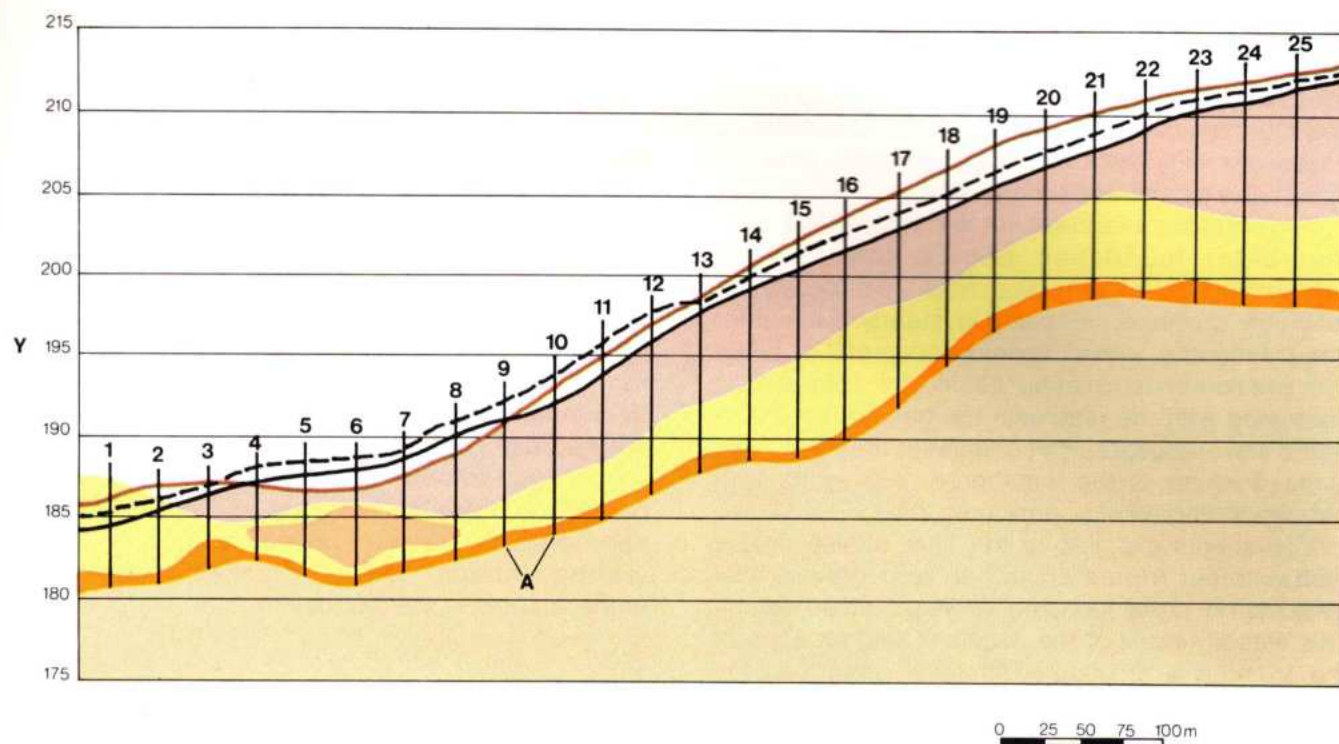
Left earthfill dam longitudinal section at downstream toe of earthfill relief wells
